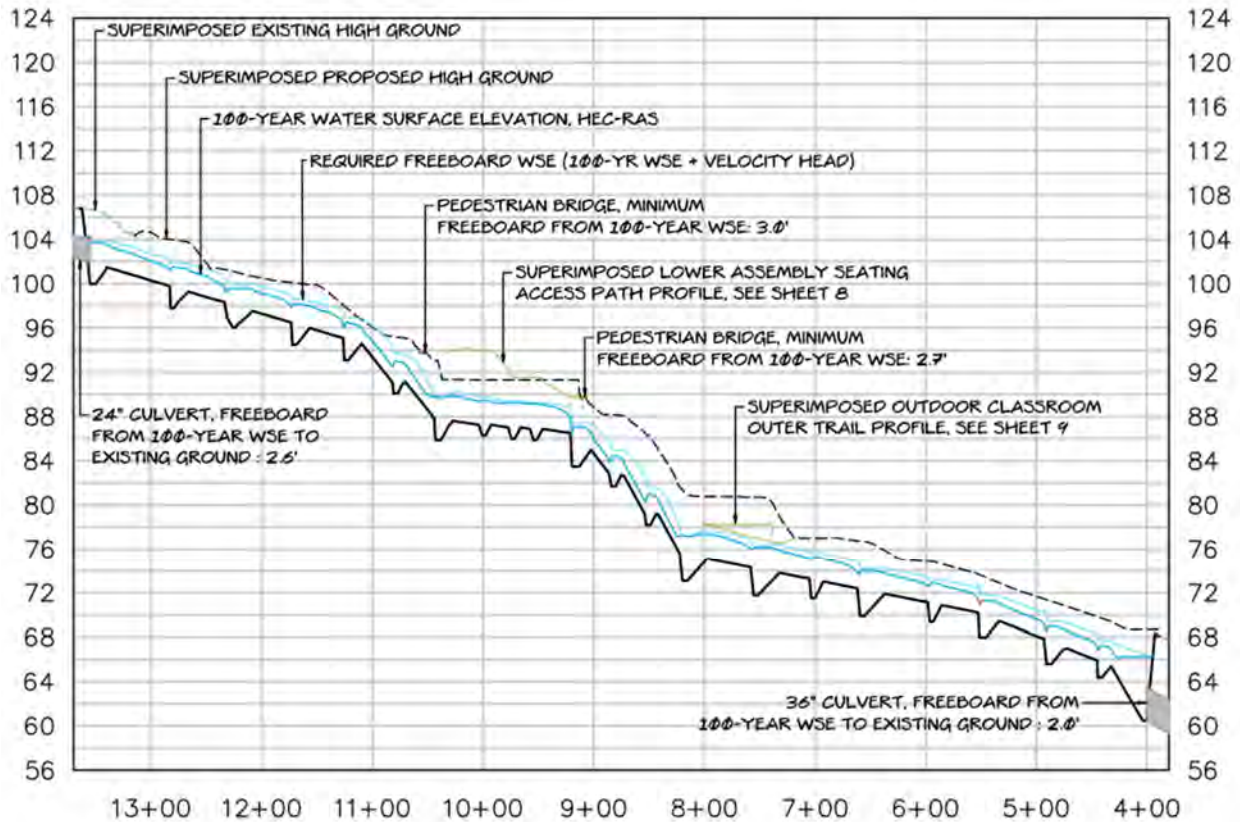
Freeboard check summary including culvert, channel, bridge, assembly area, and outdoor classroom.
